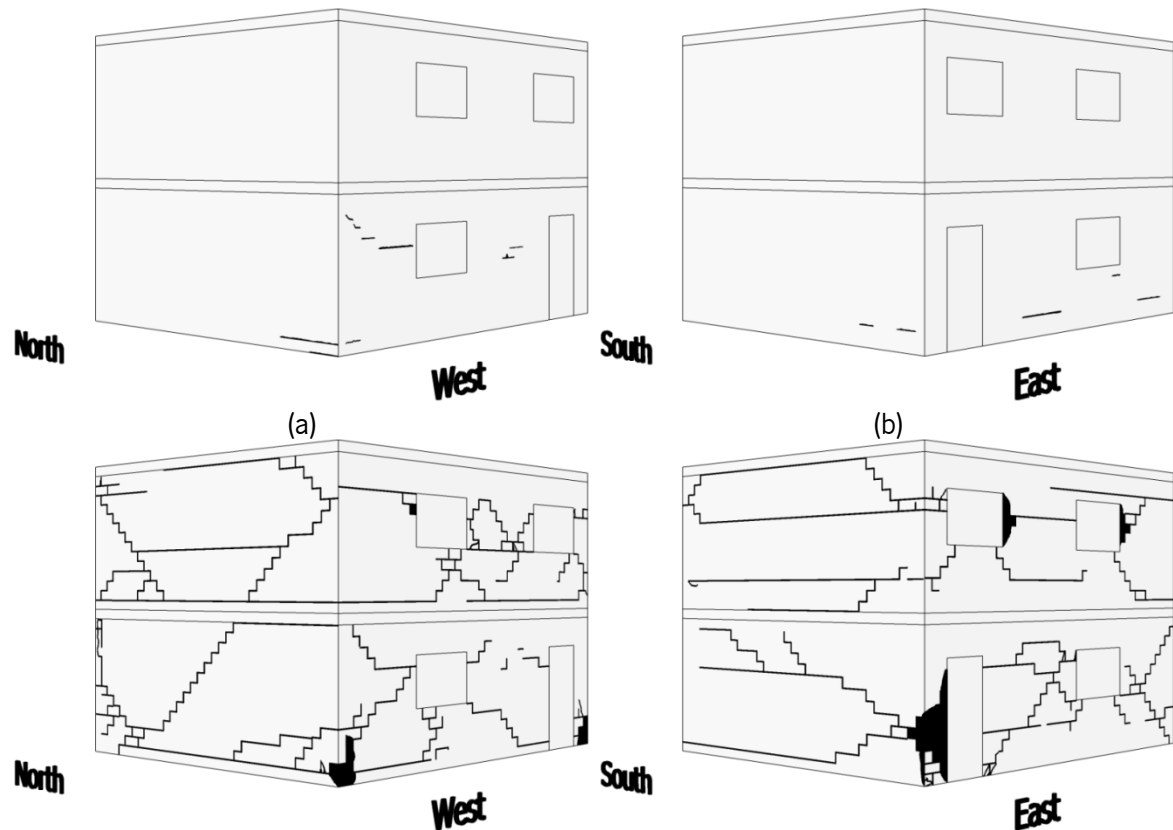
Crack patterns after the seismic input of 250%: (a, b) RM building and (c, d) UM building
